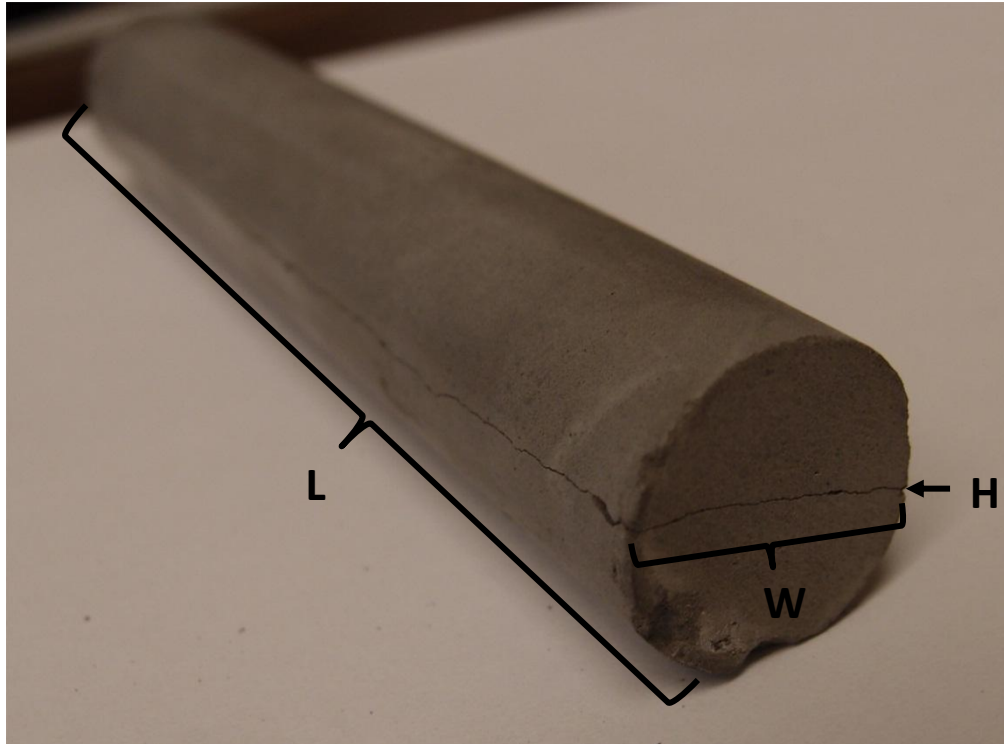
Fractured cement core showing relevant parameters used in calculating fracture properties.
